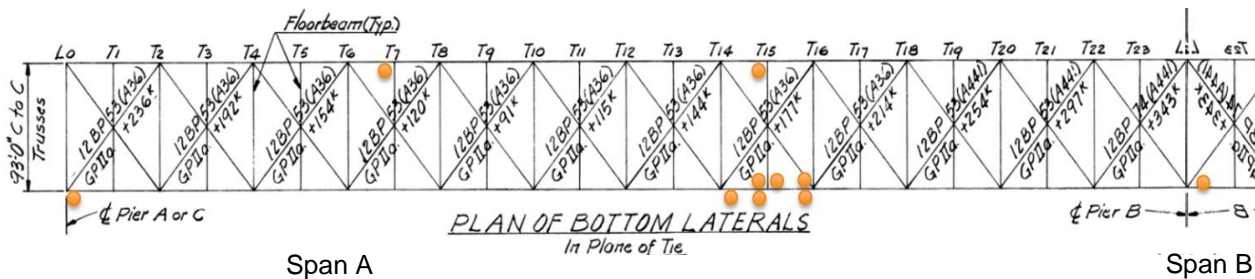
Locations in Span A of core samples removed from other tie girder groove welds with defect indications.
